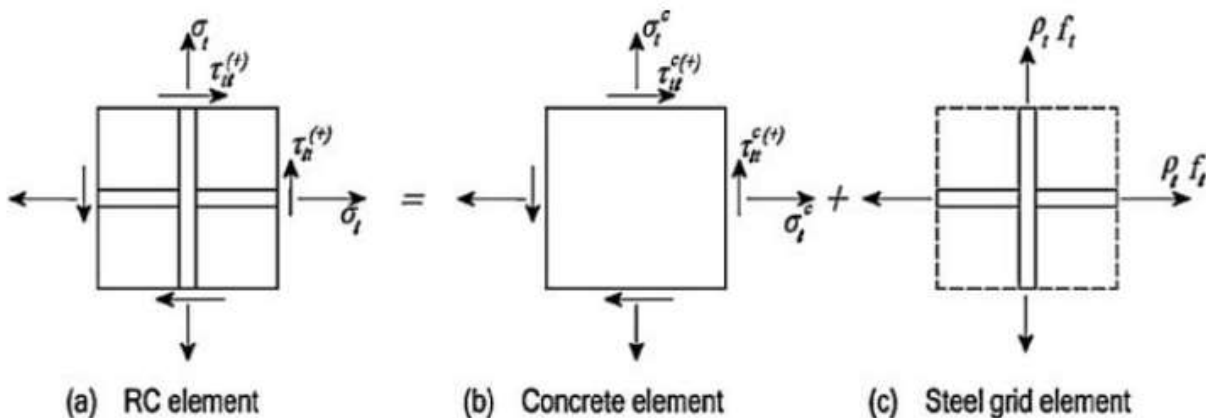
Reinforced Concrete membrane element subjected to biaxial and shear stress [5]
